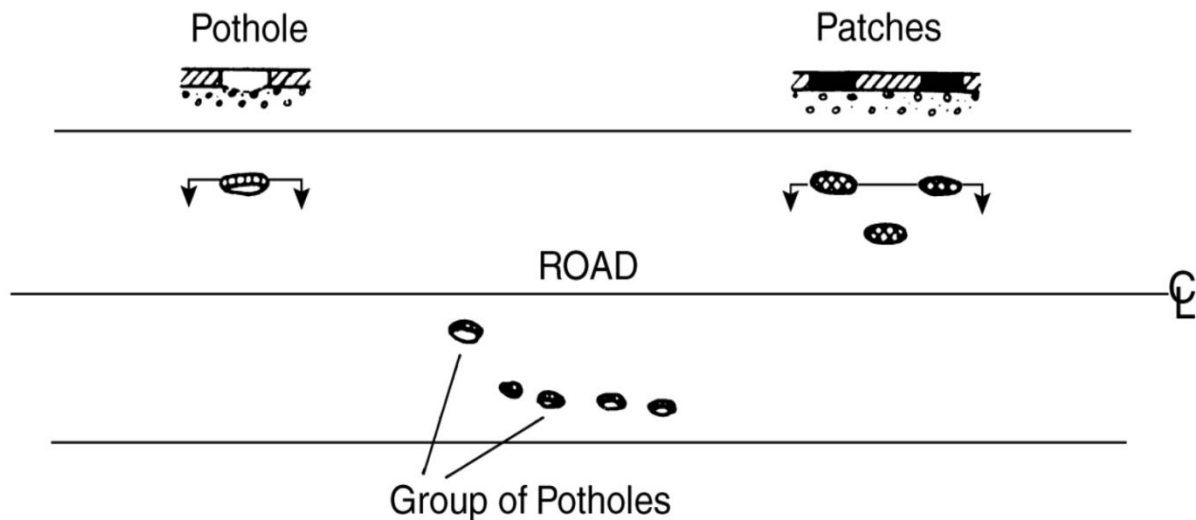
Sketch of surface defects in flexible pavements, Pothole and patches (Source: Austroads, 1991).
